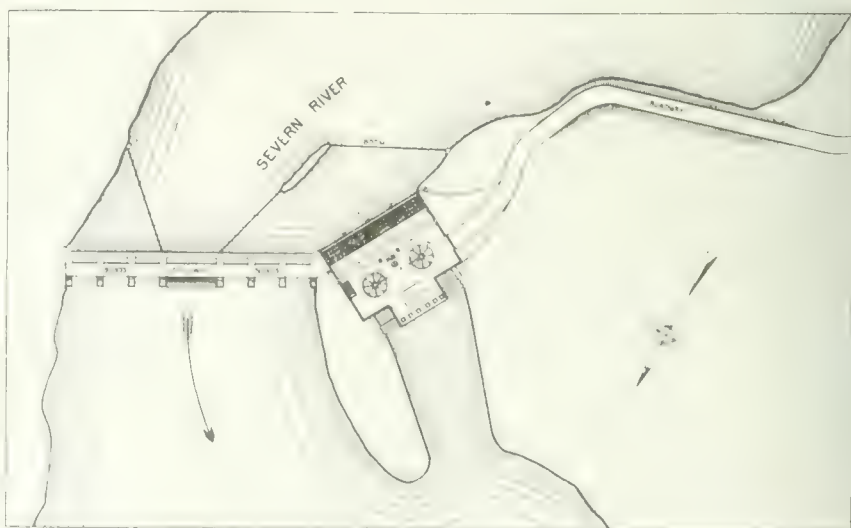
General Arrangement of Wasdell's Falls Power Plant.
